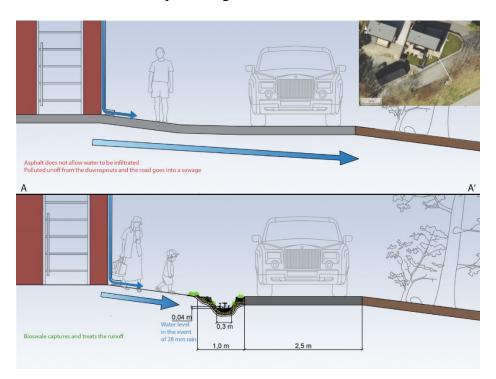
Cross-section of the proposed Bioswale in the Sørmarka arena area
